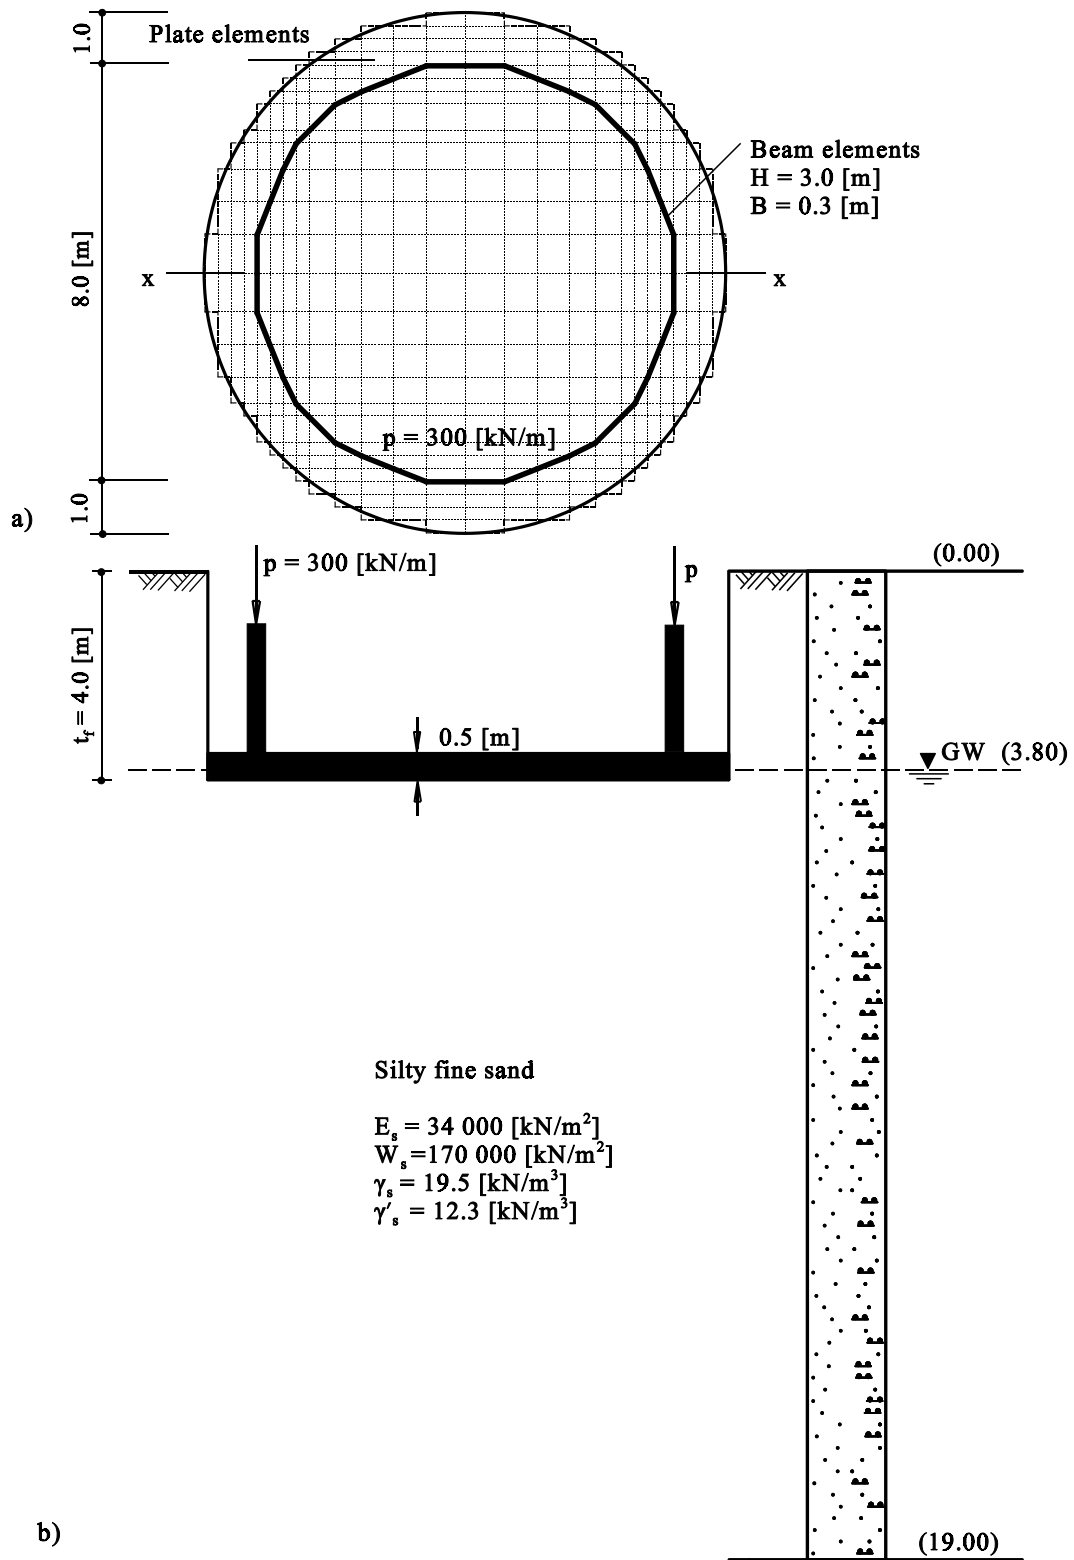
a) Plan of the raft with wall load, dimensions and mesh
